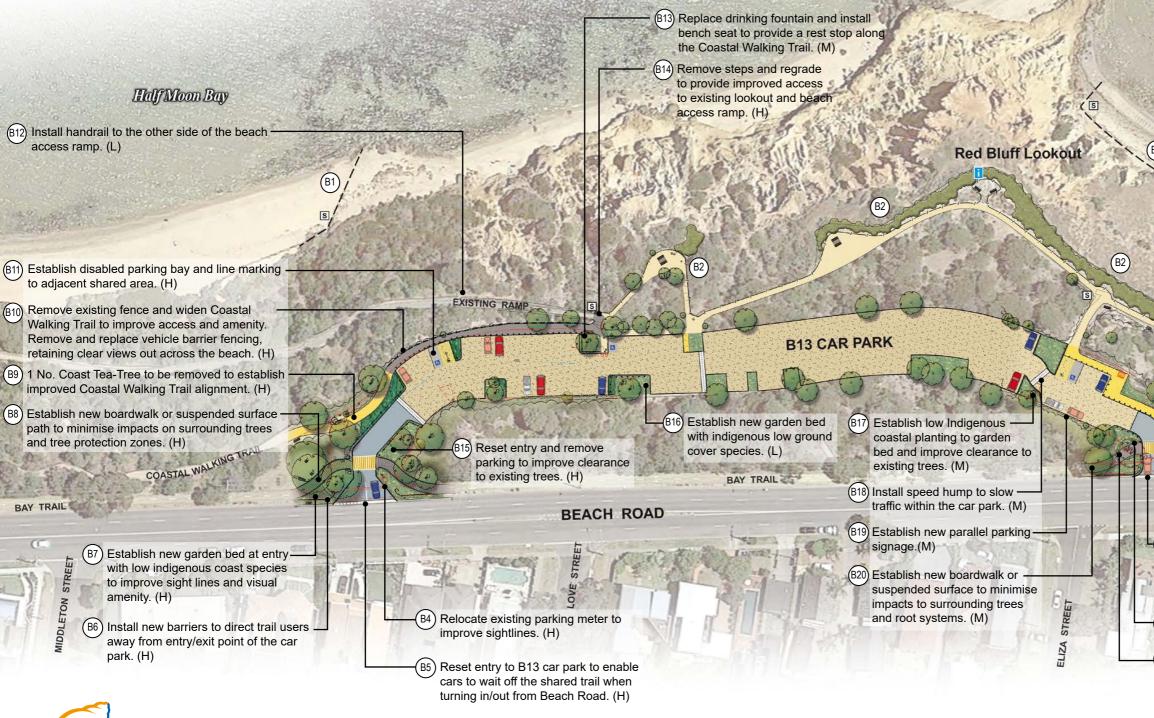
DETAIL PLAN C - RED BLUFF AND B13 LOVE STREET CAR PARK
